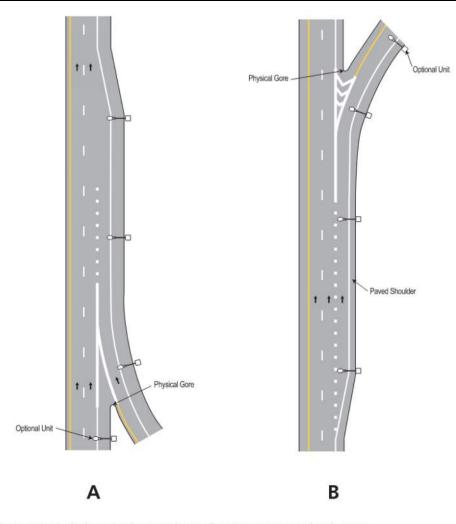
Typical Luminaire Locations: A) Entrance Ramp; B) Exit Ramp
